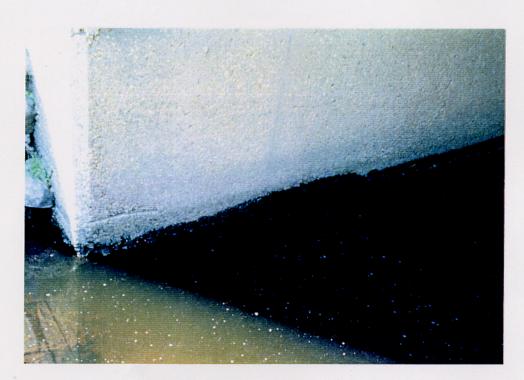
Choate Brook Bridge, Downstream End of the Right Abutment
